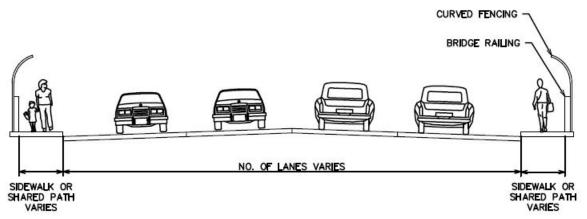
Typical Section of Curved Fencing Added to Existing Crossing
